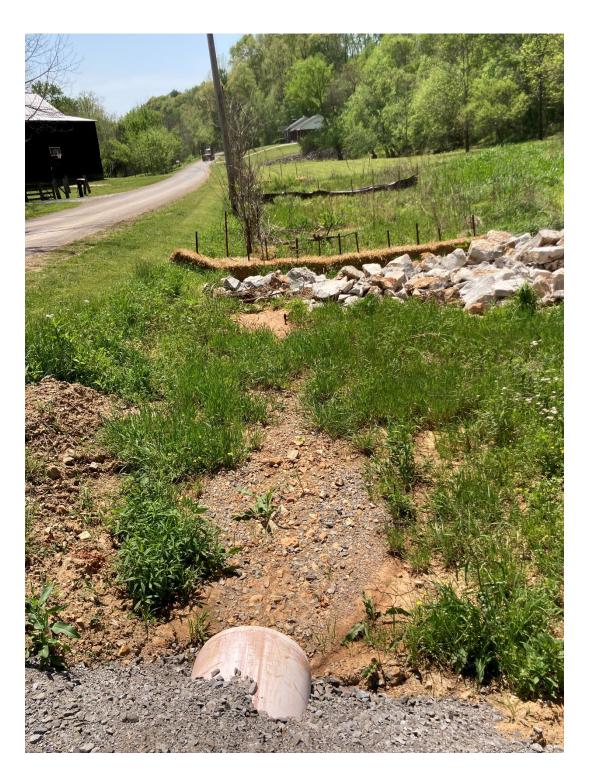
Road ditch culvert at the facility entrance and a series of BMPs below the culvert.
